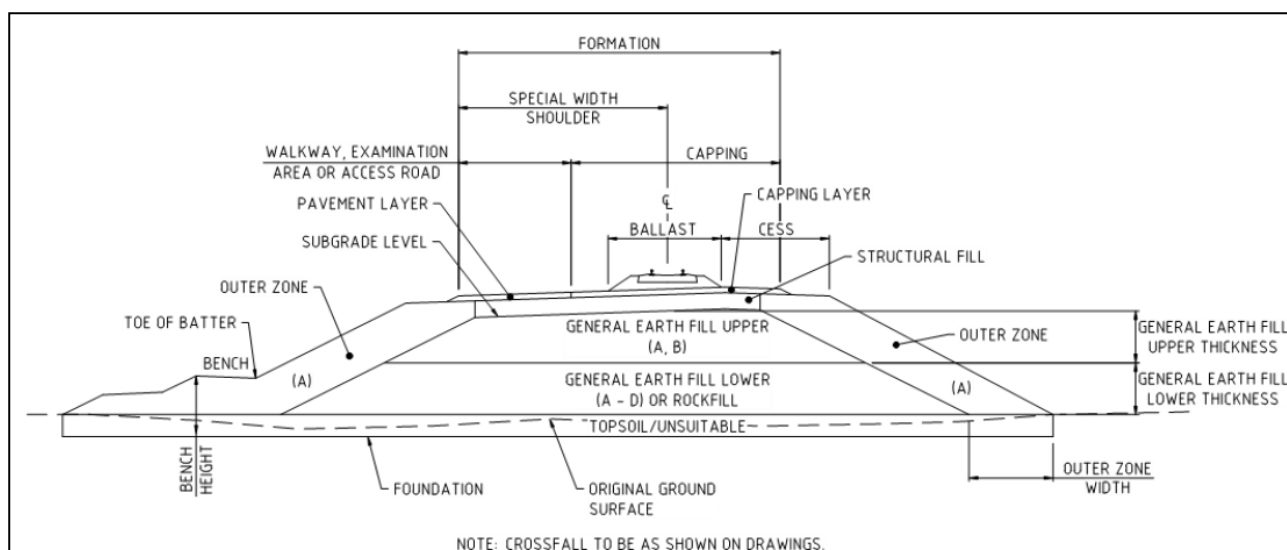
SCHEMATIC OF RAIL ZONED EMBANKMENT CROSS SECTION
